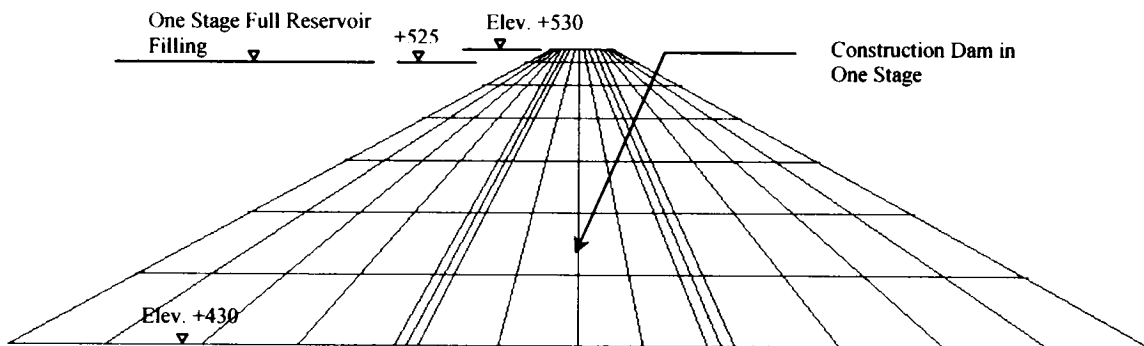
(a). One Stage of Construction Dam and One Stage Full Reservoir Filling
